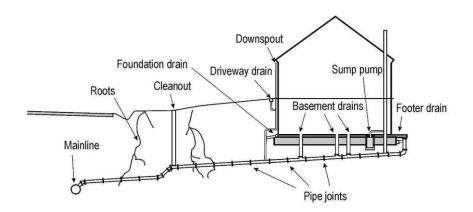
Typical Layout of Sewer Laterals (Simicevic and Sterling, 2005)
